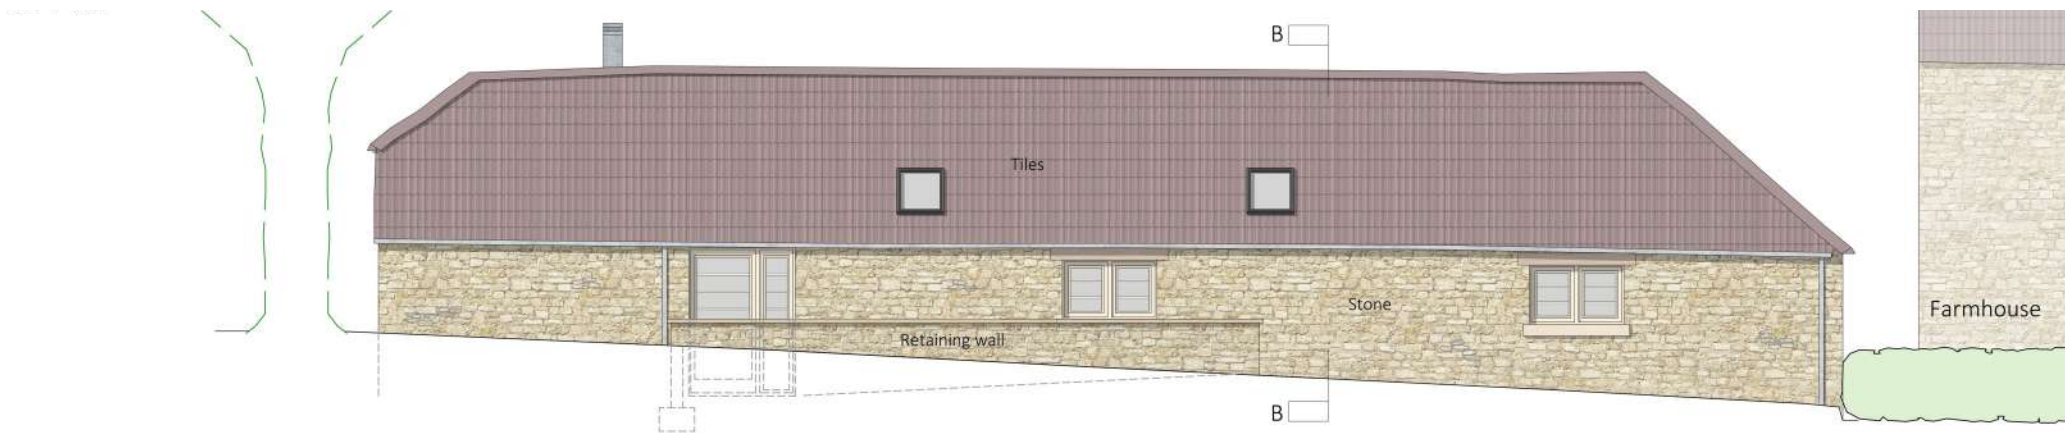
PROPOSED NORTH ELEVATION,(NTS)
